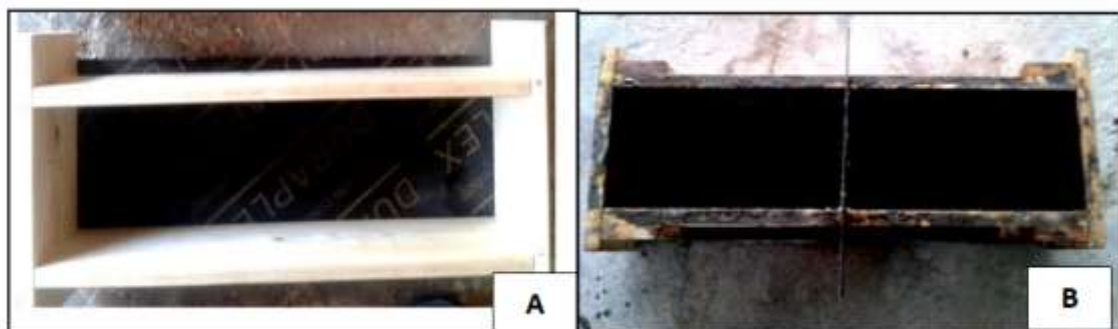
(A) Mold for Casting Beams without Notch, (B) Mold for Casting Beams with Notch.
